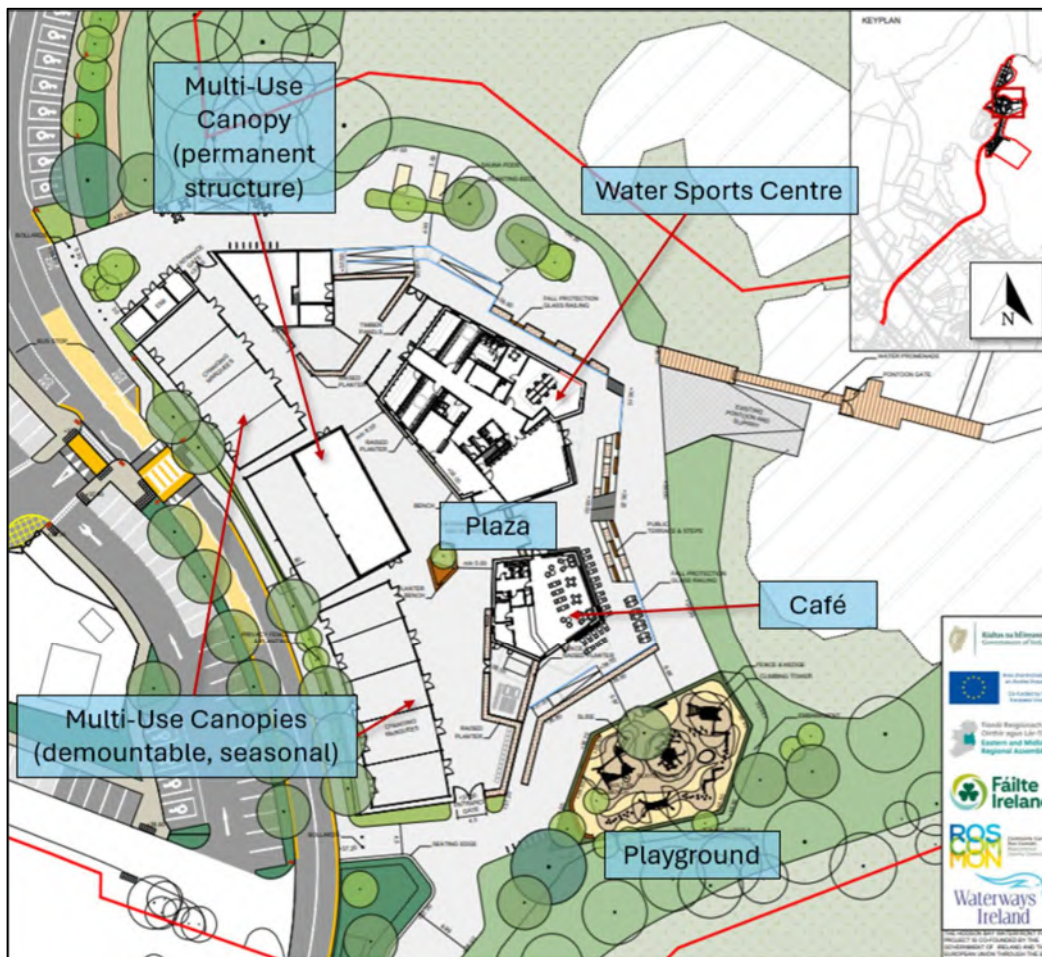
Plan view drawing of proposed Water Sports Pavilion, extracted and modified from drawing no. HBWP-ZZ-ZZ-DR-OKR-LA-001104
